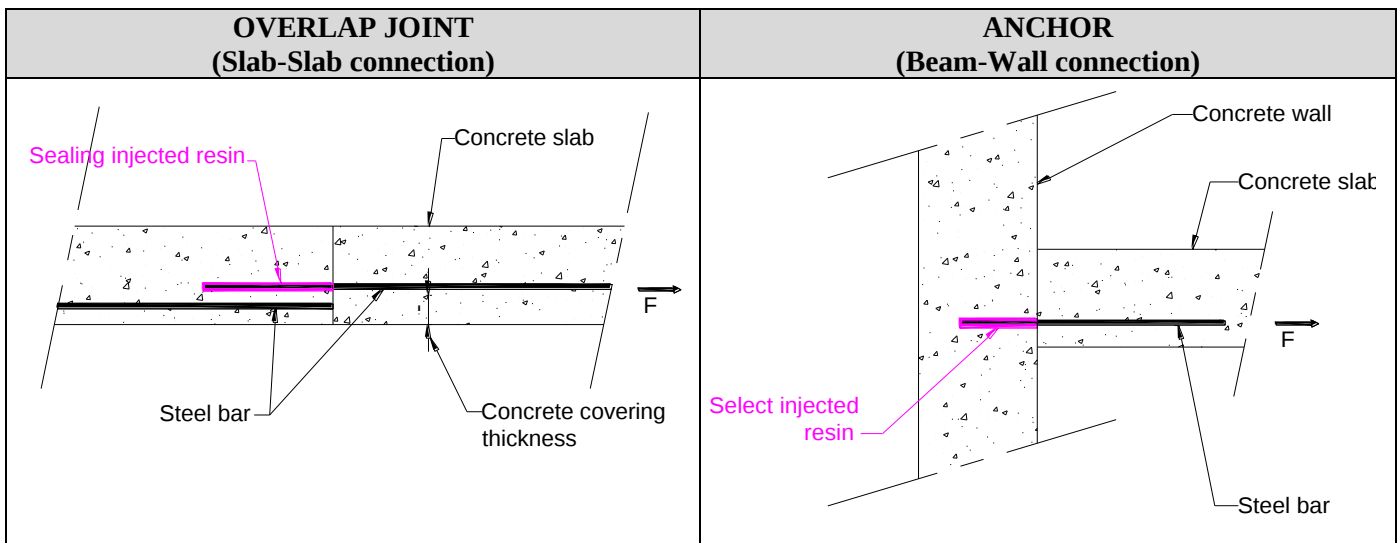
Sketches of a Slab-Slab connection left and of a Beam-Wall connection
